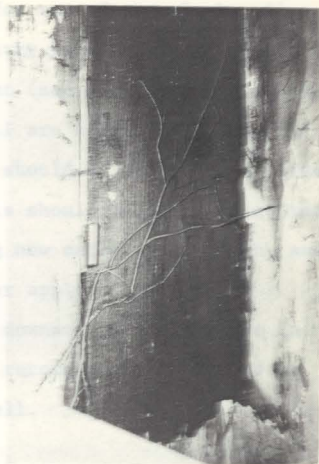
Northwest corner of the parlor wall. Vine is growing up the inside of the wall.
